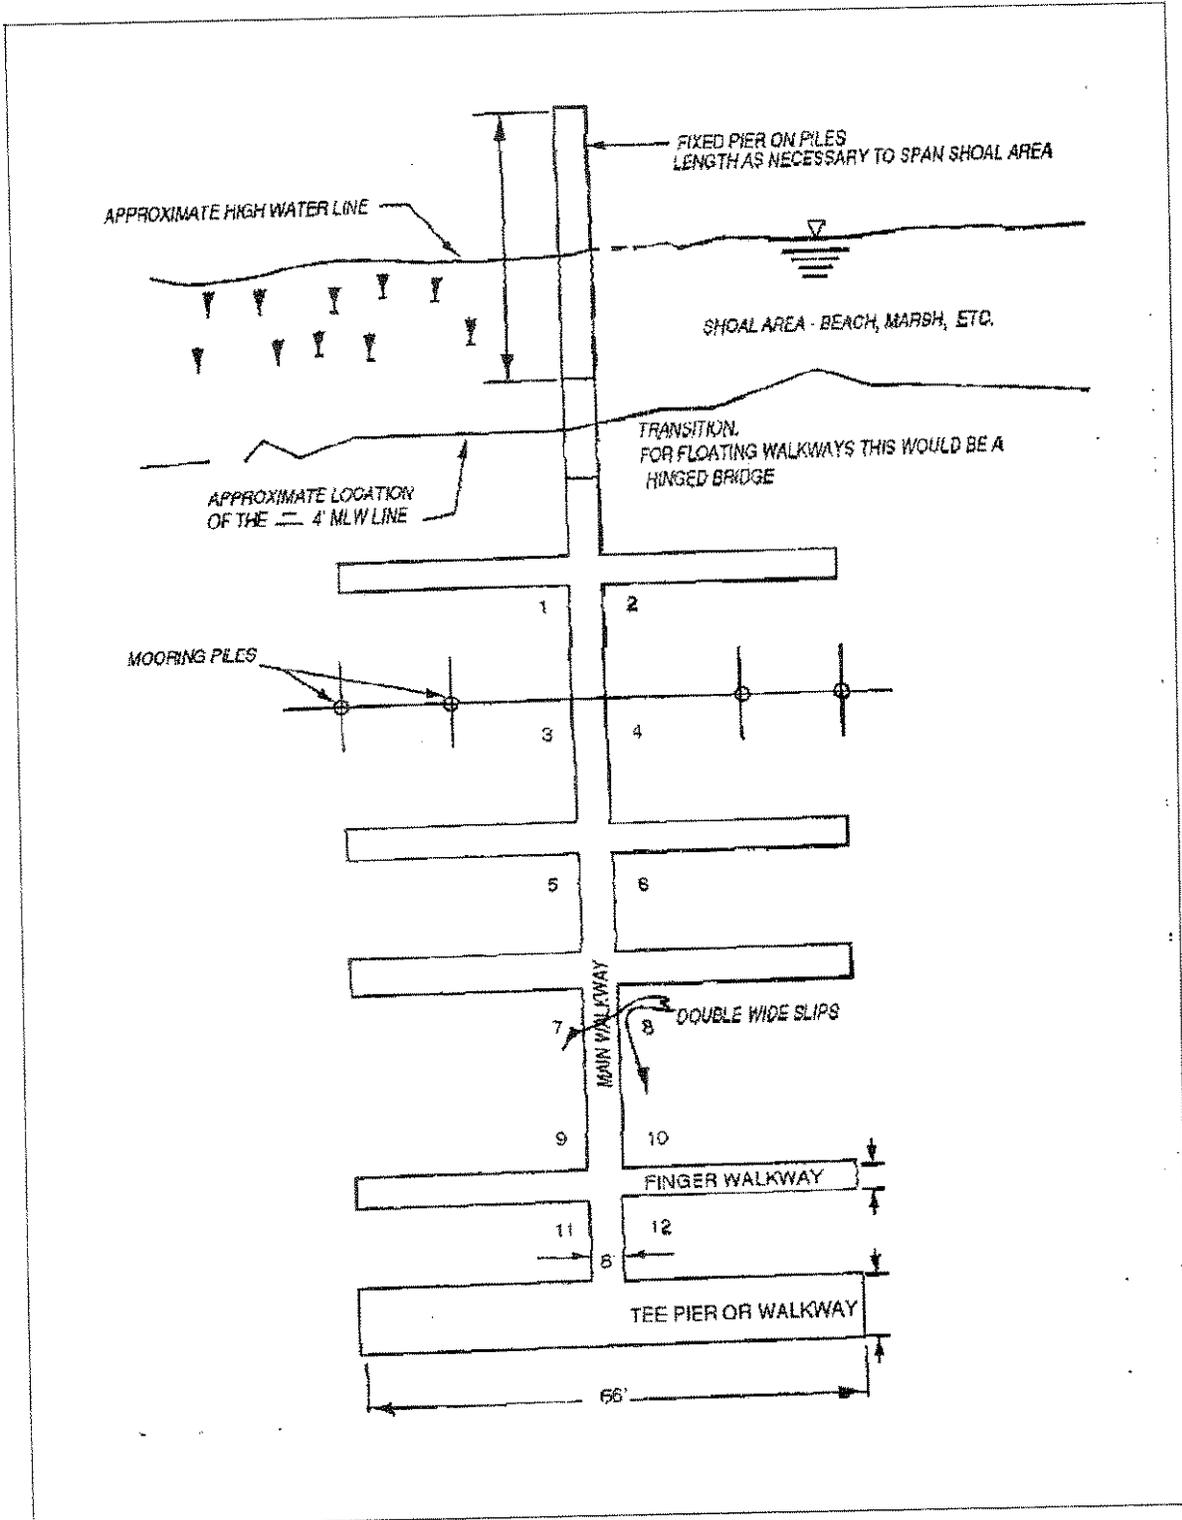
Basic layout for marina walkways (Chamberlain 1983)
